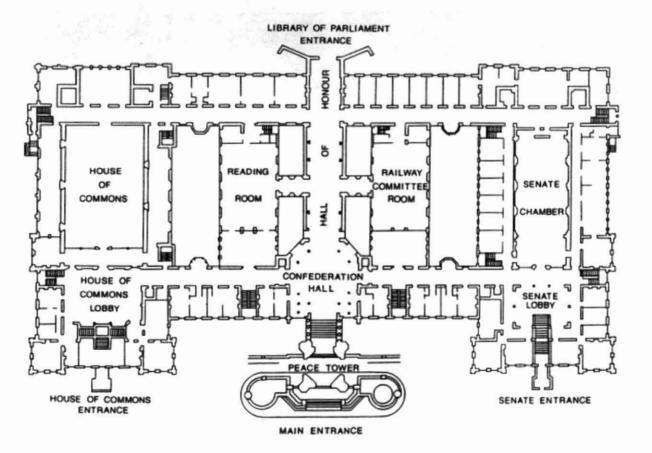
Generalized plan of the main floor of the Centre Block, modified from plan in PWGSC (1994).
